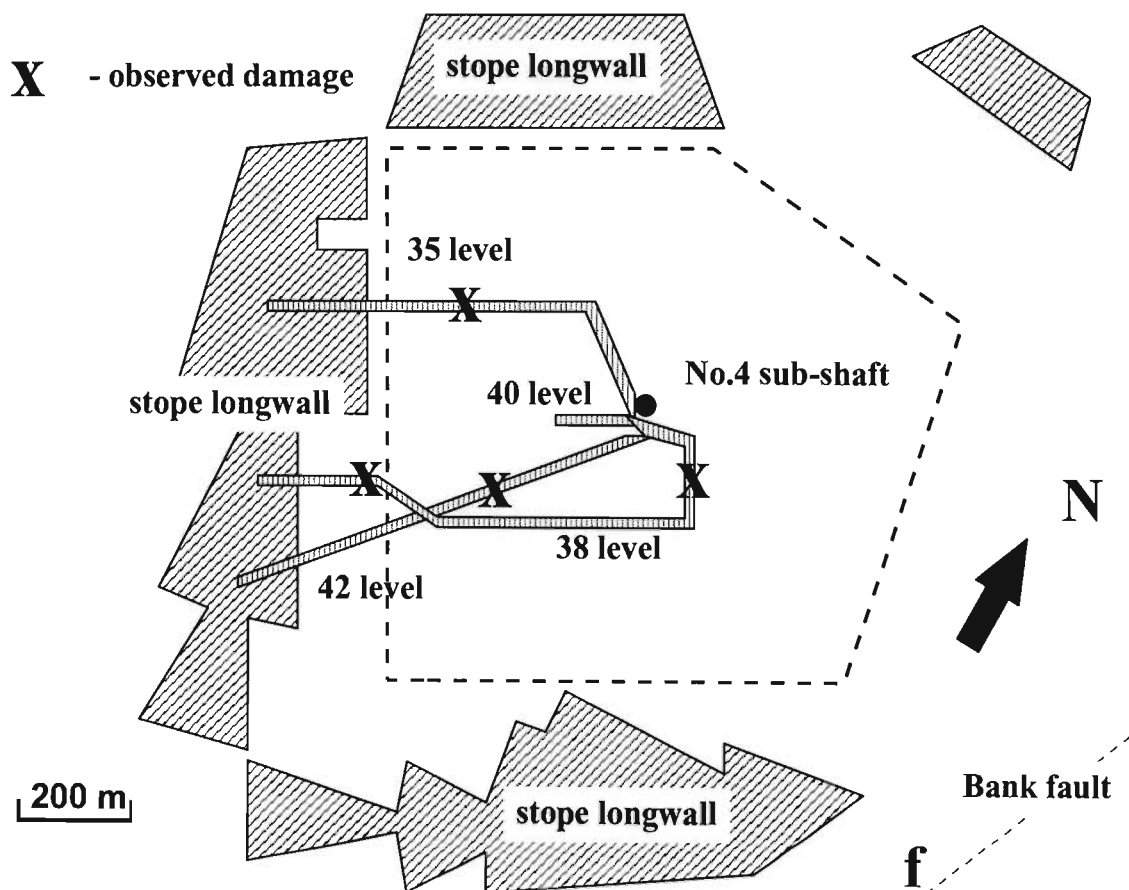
Schematic plan of tunnel and stope layout and distribution of observed damage.
